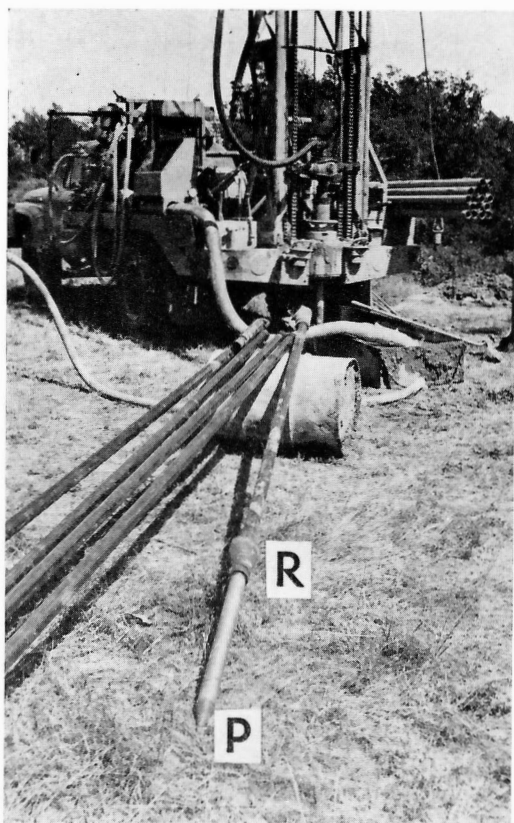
PLATE II. Piezometer point (P) and rubber basket (R) ready for installation. The rubber basket is made on the spot from a 2-foot section of used truck tire, held in place by a stainless steel hose-clamp.
